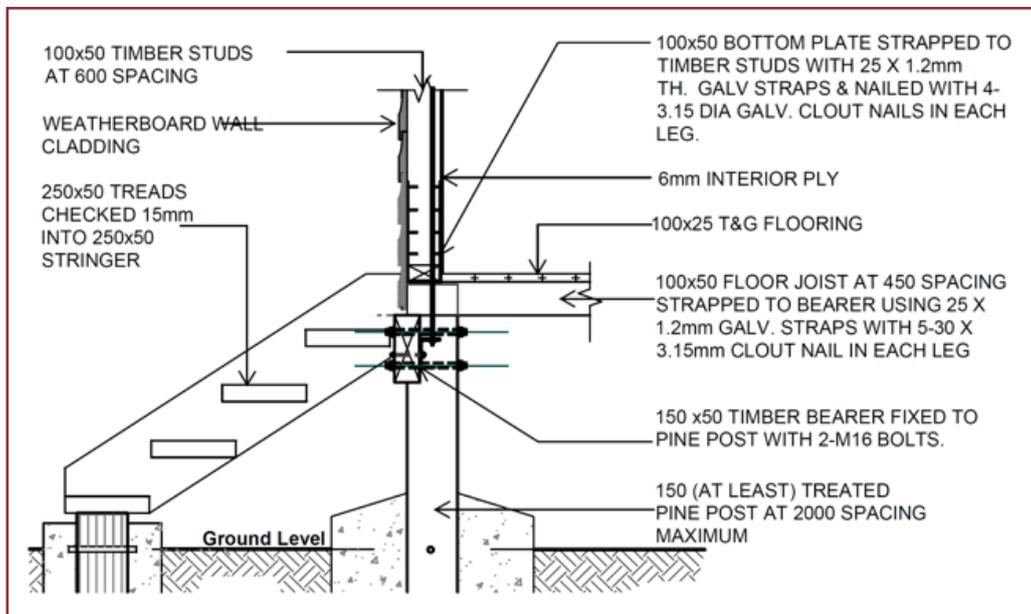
Timber floor system at entry threshold (Source: Fiji Rural Housing Unit standard drawings)
